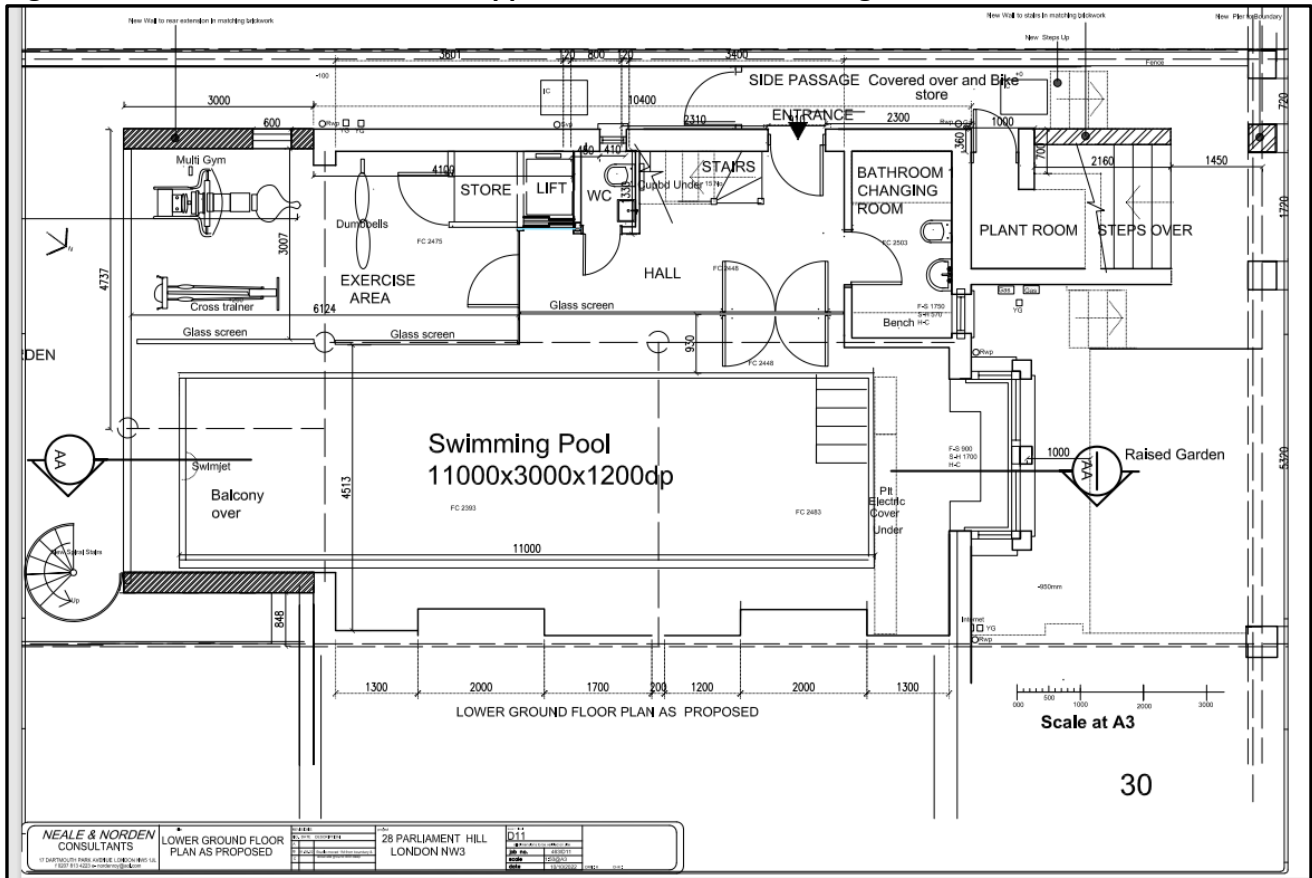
Lower Ground Floor Plan D11A. Application 2023/0396/P. Granted 30 August 2023.
